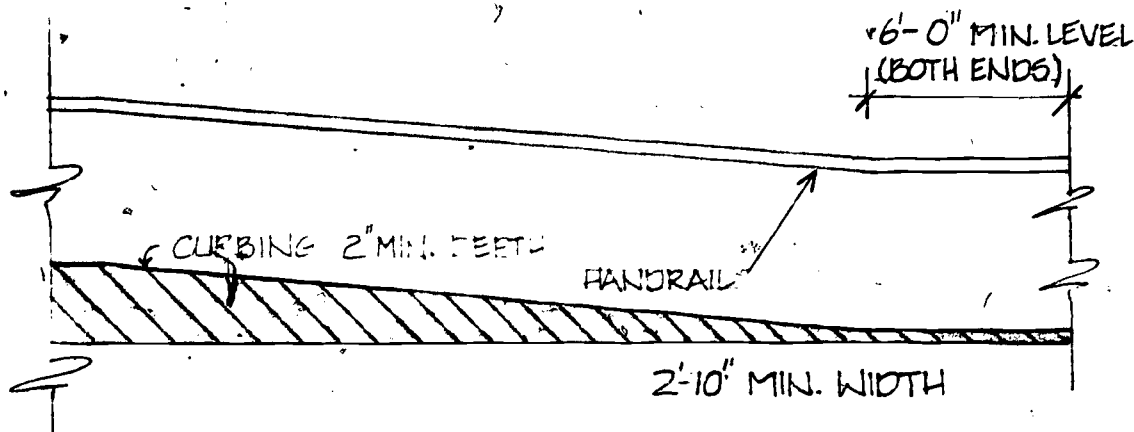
RAMP SECTION 1:12 (8%) MAX. SLOPE
